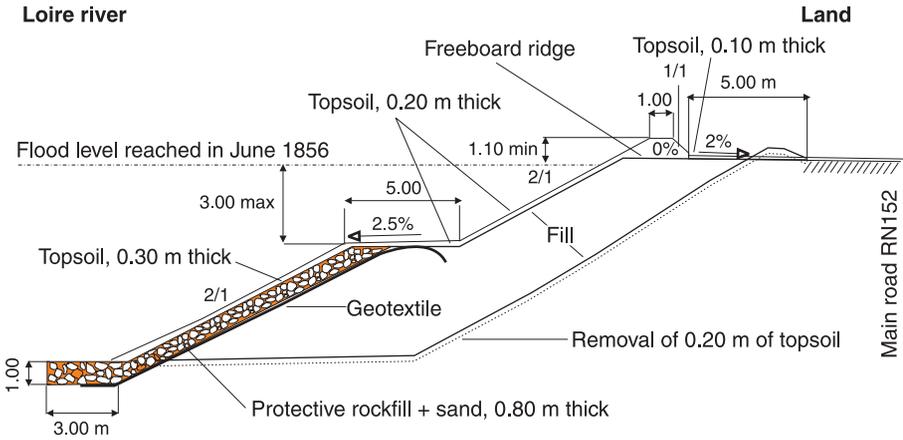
Typical cross-section showing reinforcement on the Loire river side of the Fondettes-Luynes dike – DDE Project Indre-et-Loire (1997)
